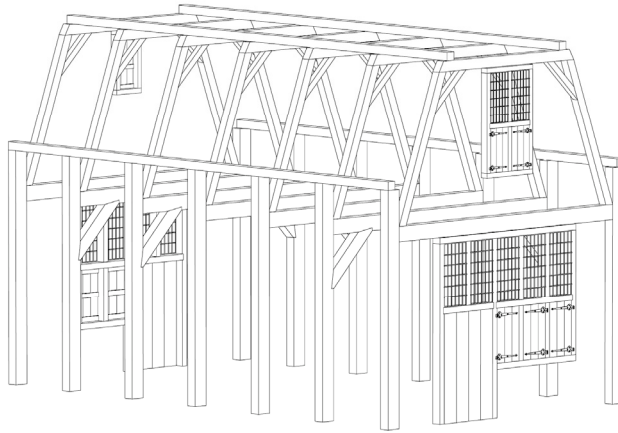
Isometric reconstruction of Jonas Bartelsen’s dwelling showing location of windows, and possible roof truss (*fliergebint*)
